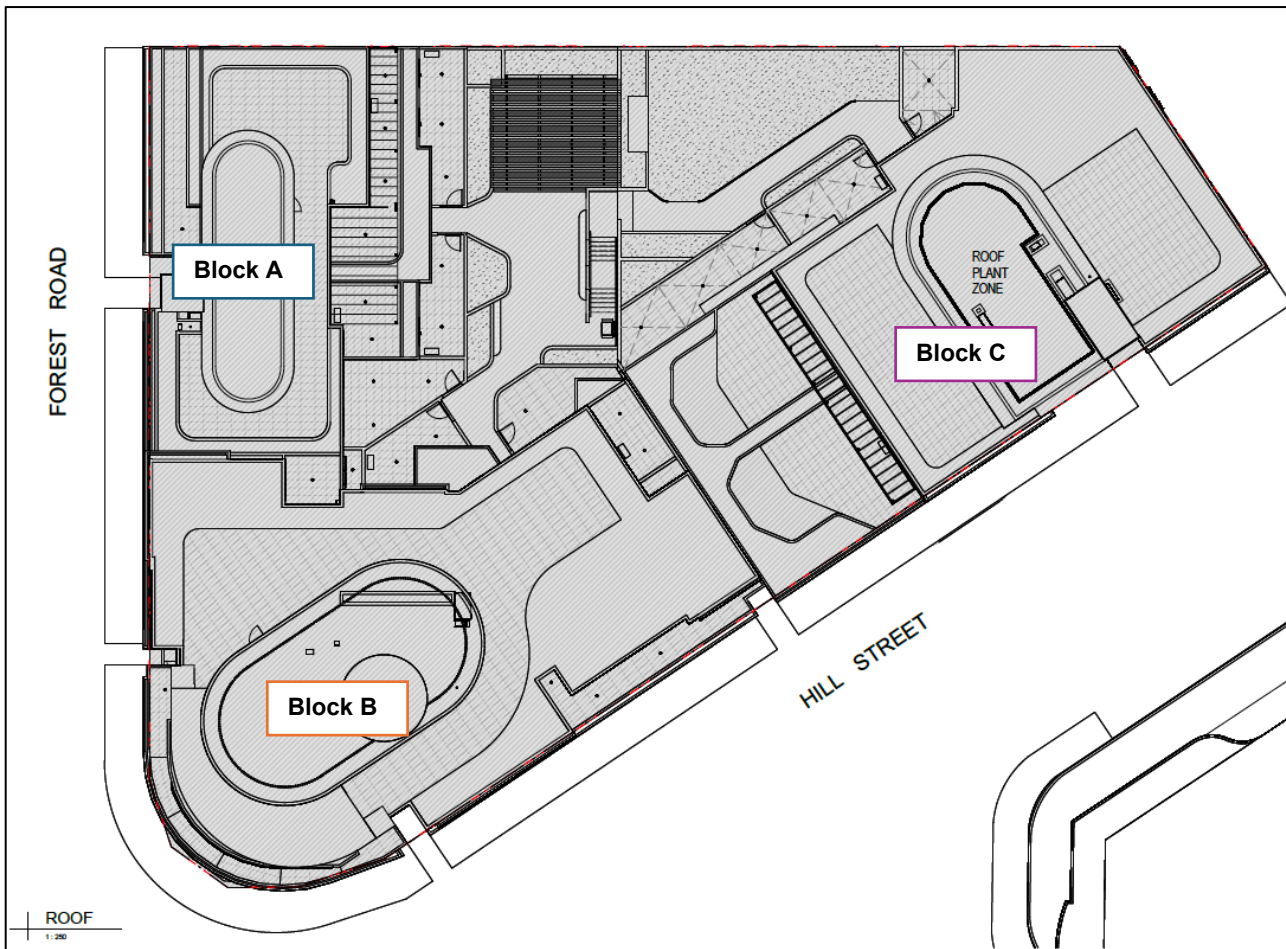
Proposed building divided into 3 portions and labelled (Source: DWA, 2025)
